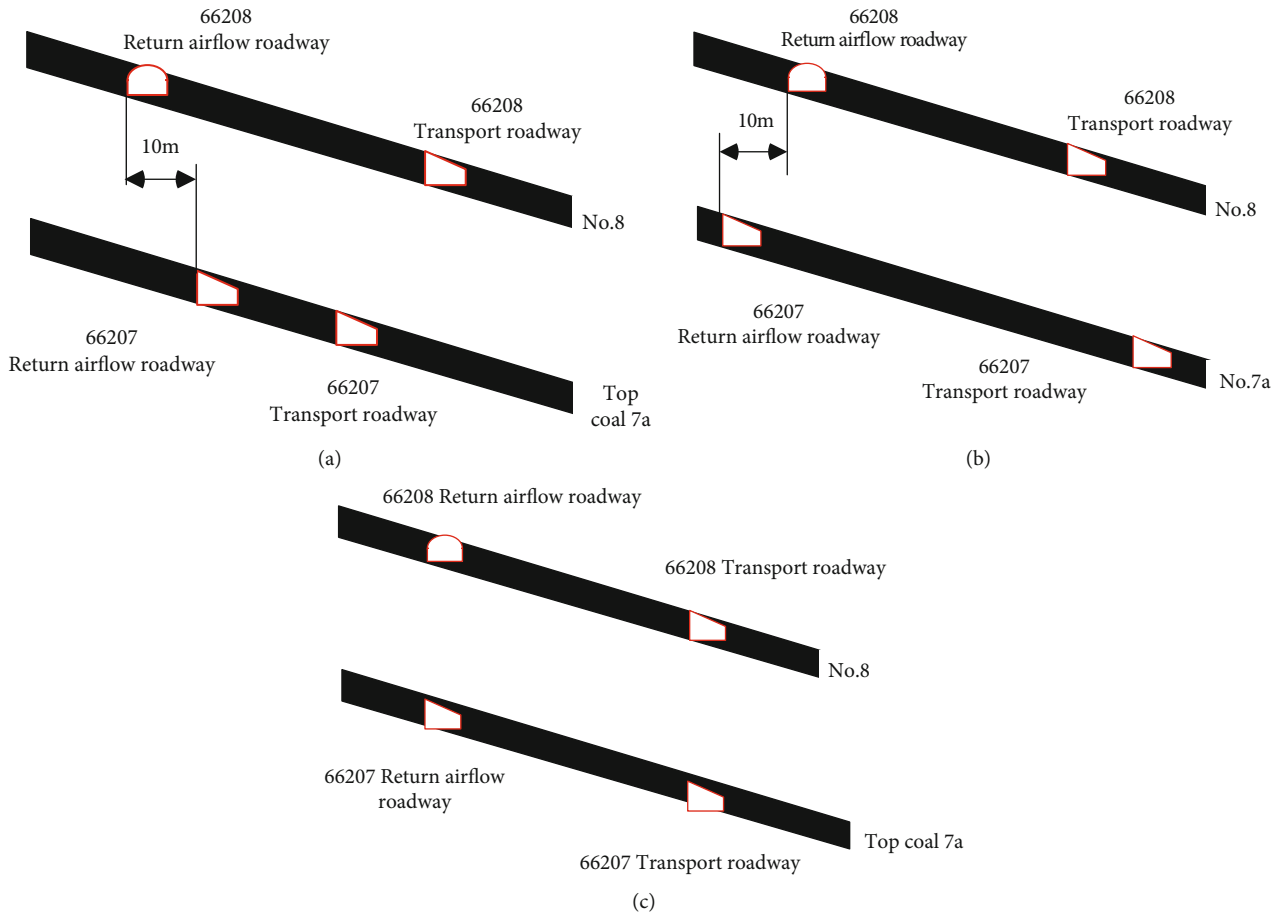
Different layouts for roadway. (a) 10 m inward-stagger layout, (b) 10 m outward-stagger layout, and (c) overlapping layout.
